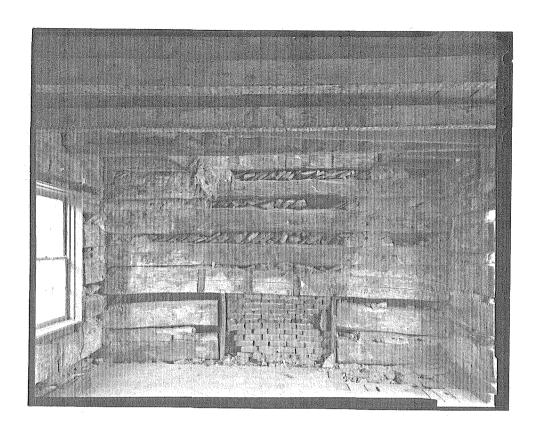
Ice Street, interior of log tenant house: view of north wall, looking north.
